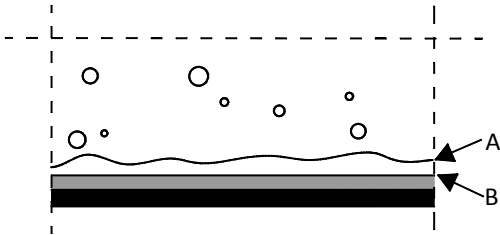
Bond failure in the concrete ($T < T_g$) (A) and in the concrete-adhesive interface ($T > T_g$) (B)
